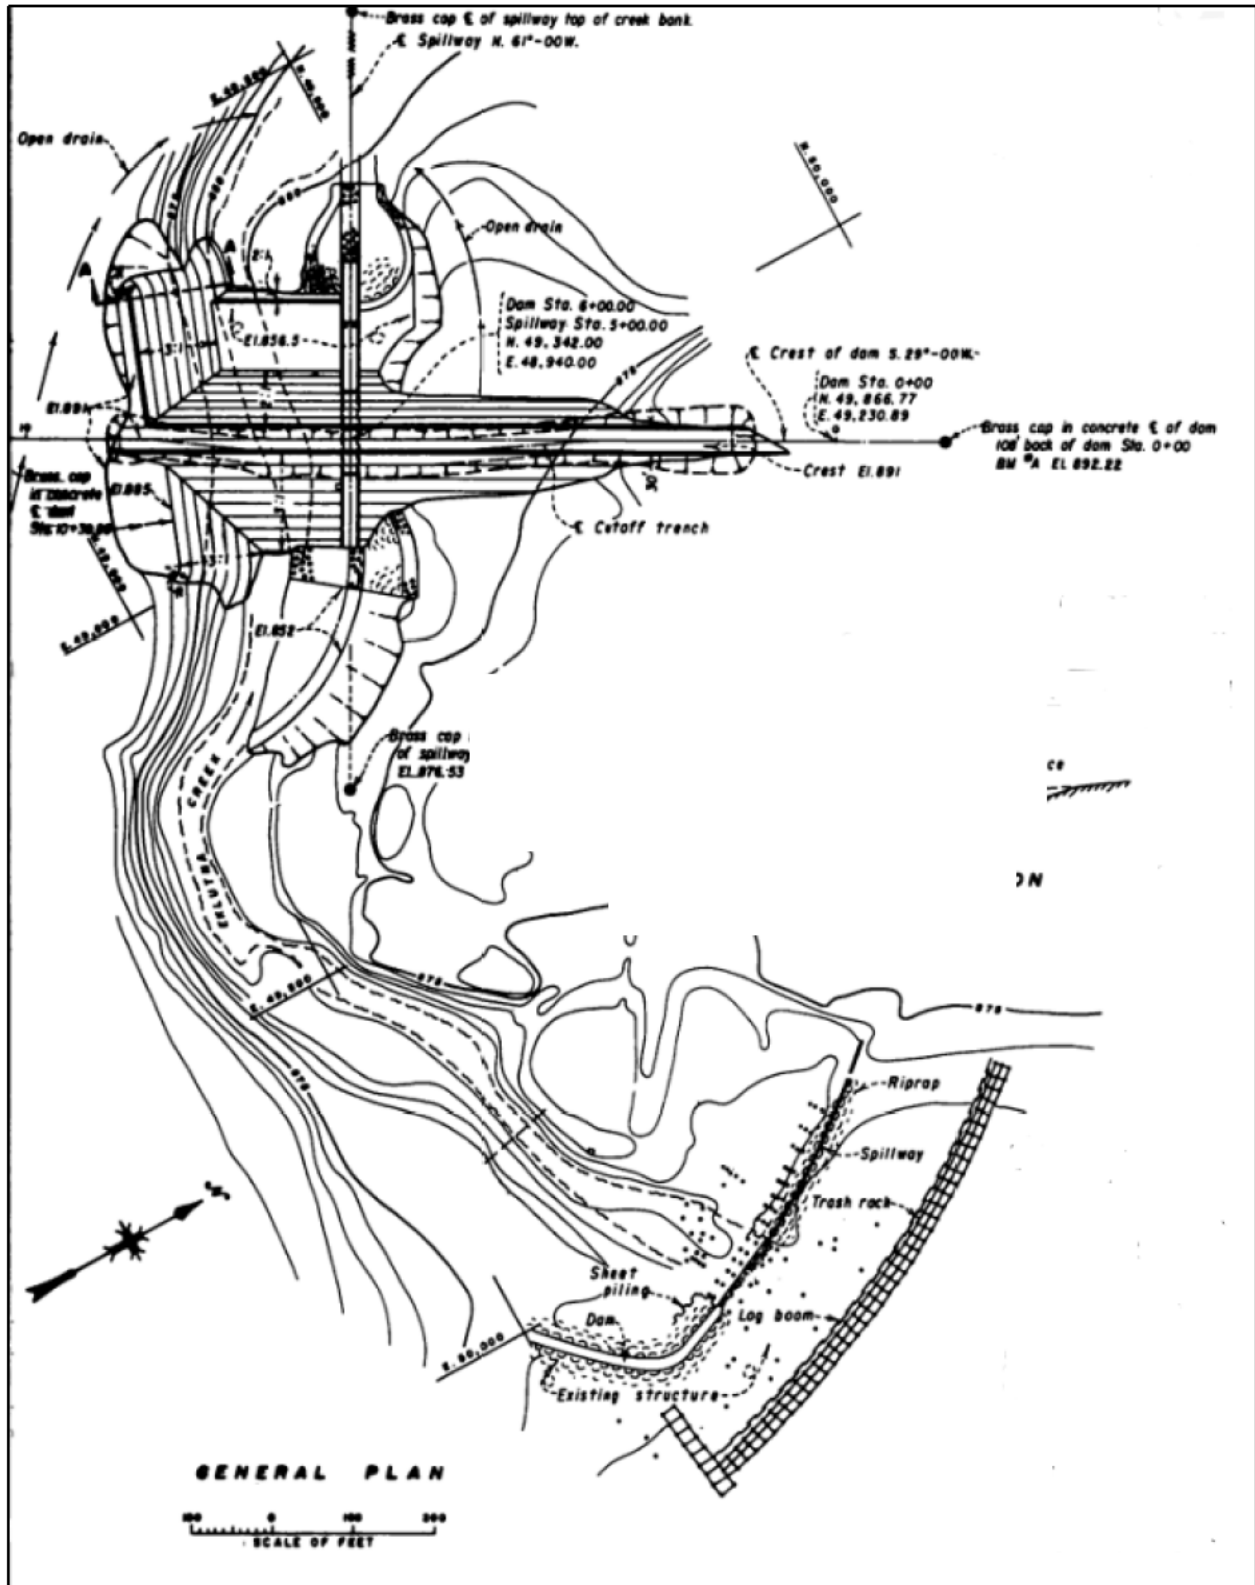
Plan view of new dam and spillway construction (USBR 1967:Figure 22).
